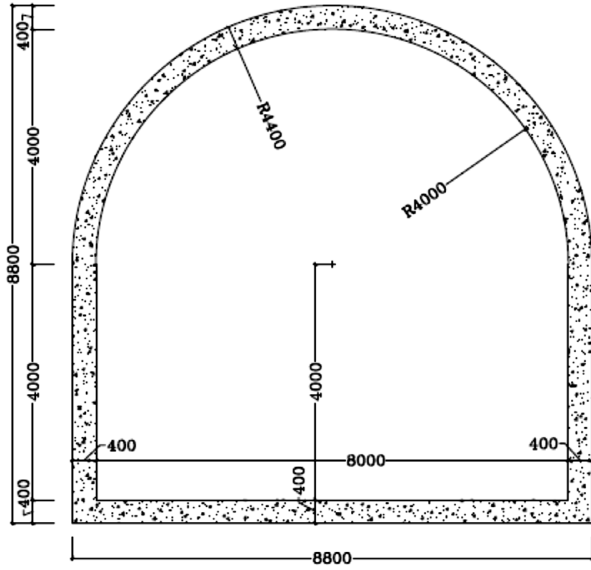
Scheme of Underground tunnel geometry (dimensions are in mm)
